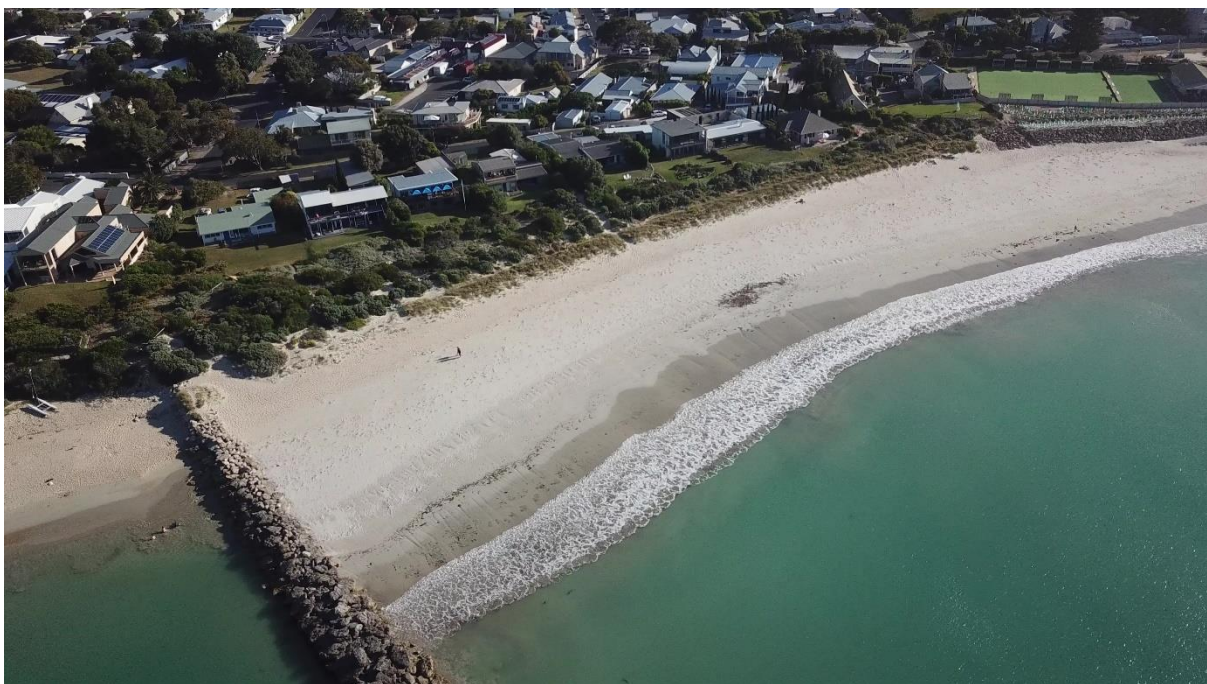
View of Town Beach looking west from the groyne towards the new seawall section
